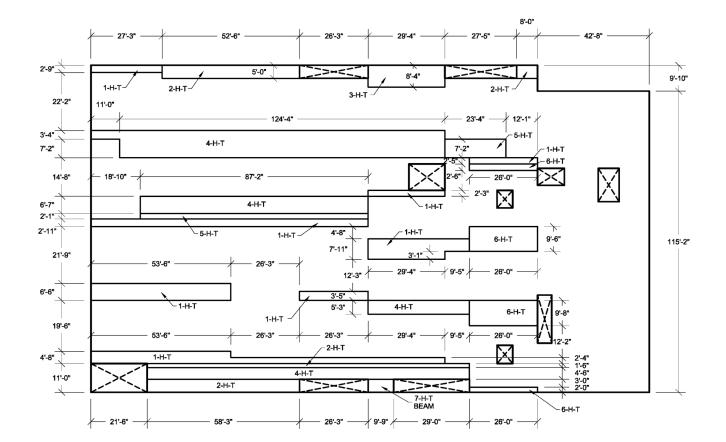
H.3-37a Elevation 35 Looking Down Horizontal Transverse Reinforcement Zones
